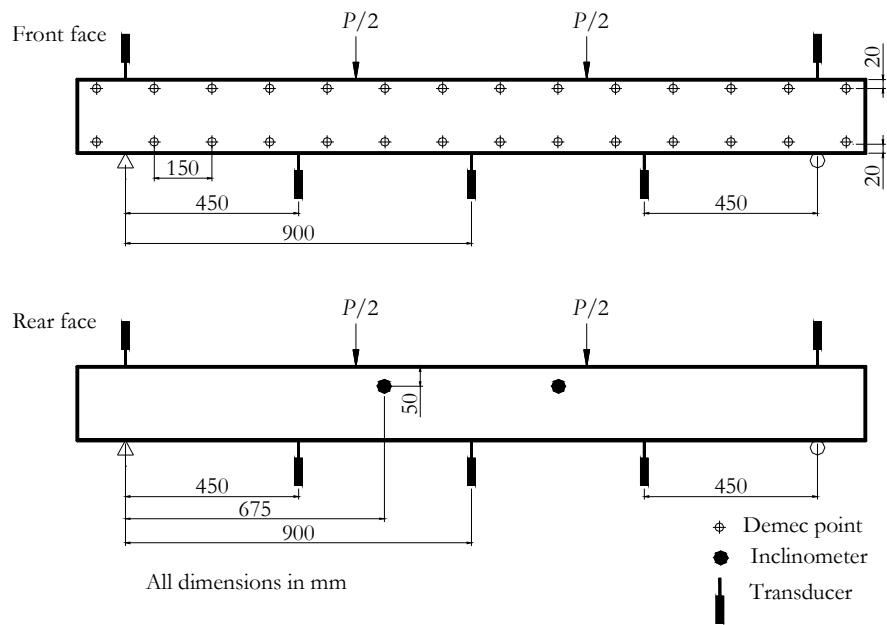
Instrumentation details for beam C1-316-D1-A.
